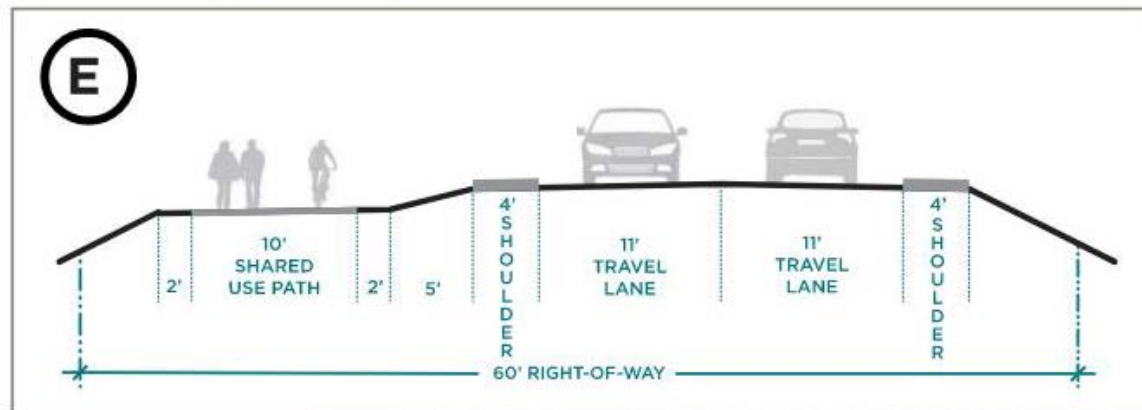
Preferred Alternative Sha-Ron/Marshall Typical Section Looking East
